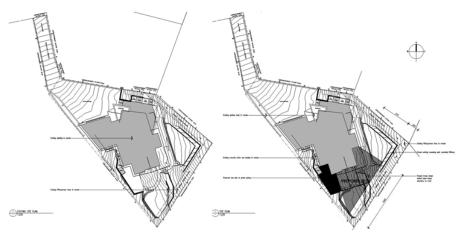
Existing and Proposed site plans (B Turner, 2022)
